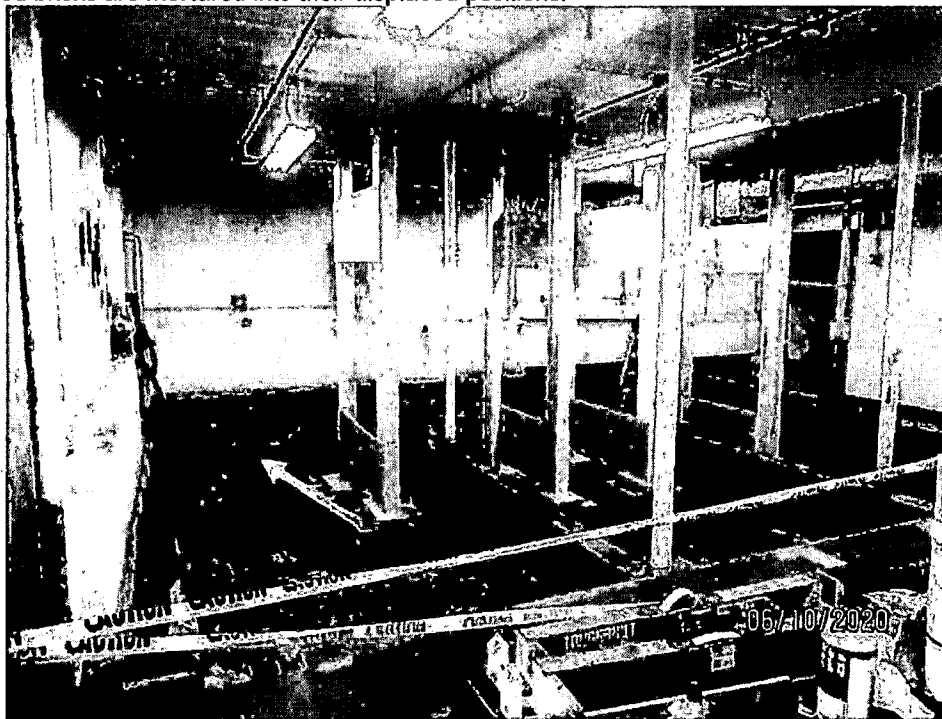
View of the ceramics room. Note the subfloor was demolished and temporary shoring installed. The northwest corner of the foundation is indicated with the red arrow.
